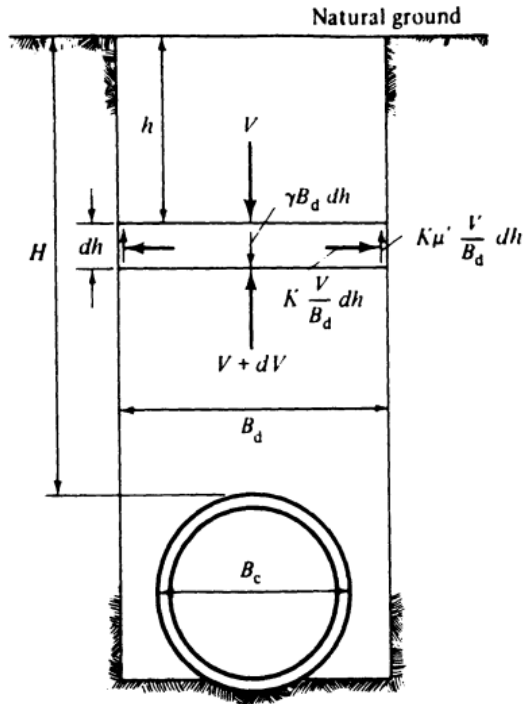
Free Body Diagram for Trench Conduit (Spangler & Handy, 1973)
